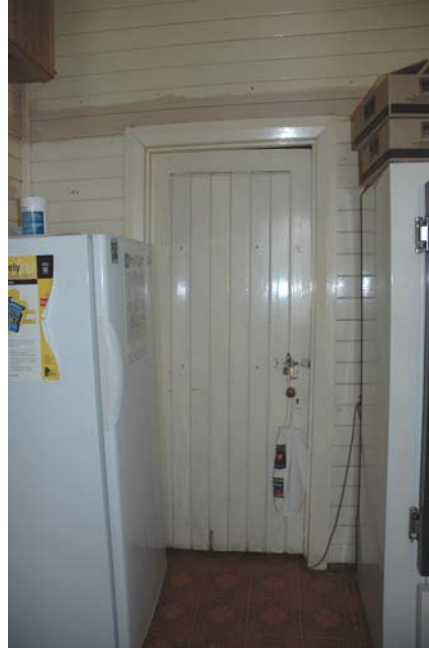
Interior, Kitchen. Door detail (east wall).
